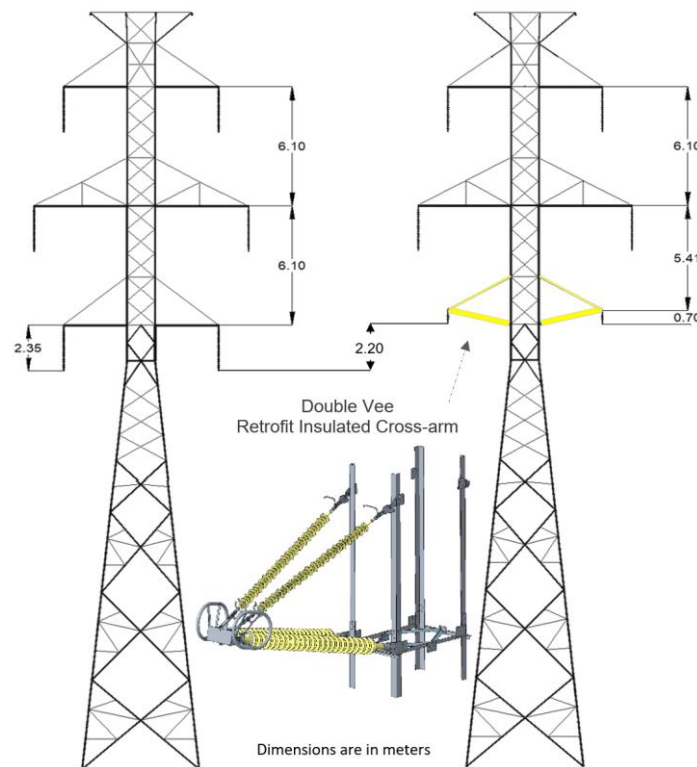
Original tower (left) and retrofitted tower (right) with insulated cross-arm.
